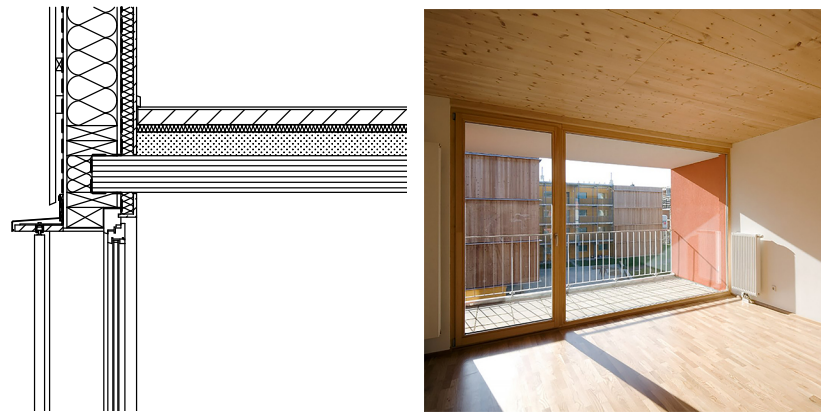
a) Exposed CLT slabs at Mühlweg (A). Drawing: Hermann Kaufmann Architekten b) The inhabitant was unsure whether the ceiling would tolerate mounting a hanging chair. Photo: Bruno Klomfar
